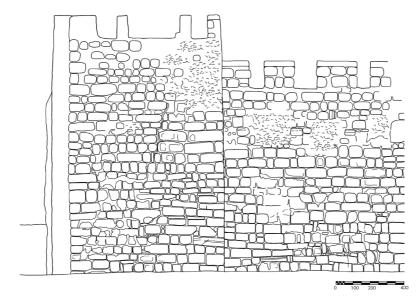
Tower and curtain wall. East façade (Ş. Güvenç Duran).
